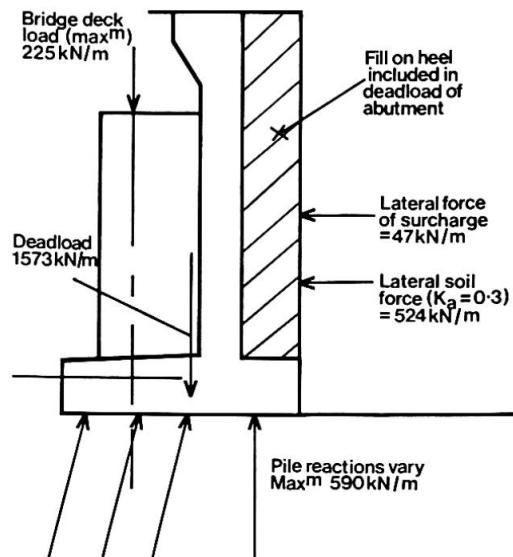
Loading diagram of forces on abutment (non-seismic loads)
